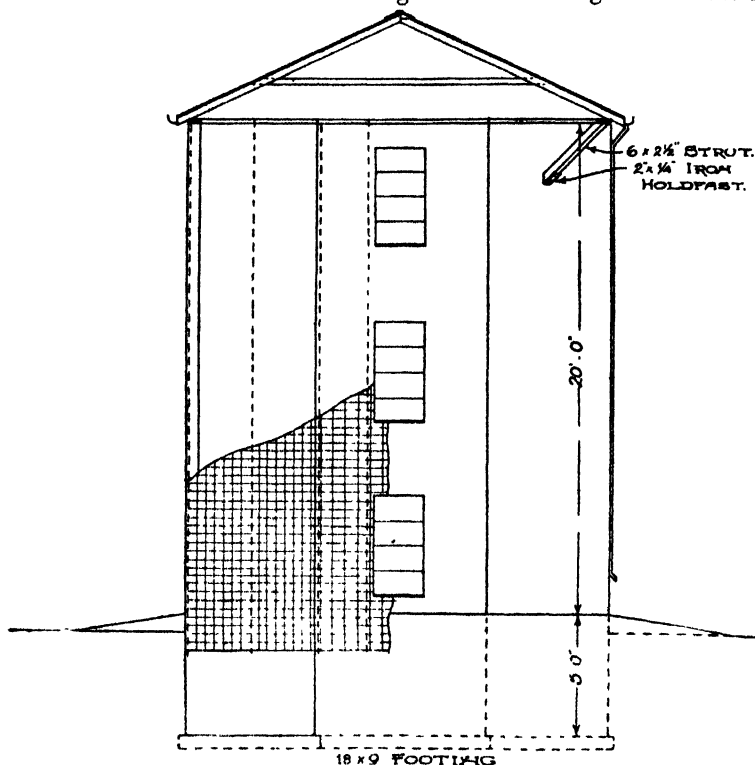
Section and Elevation of Octagonal Concrete Silo.
